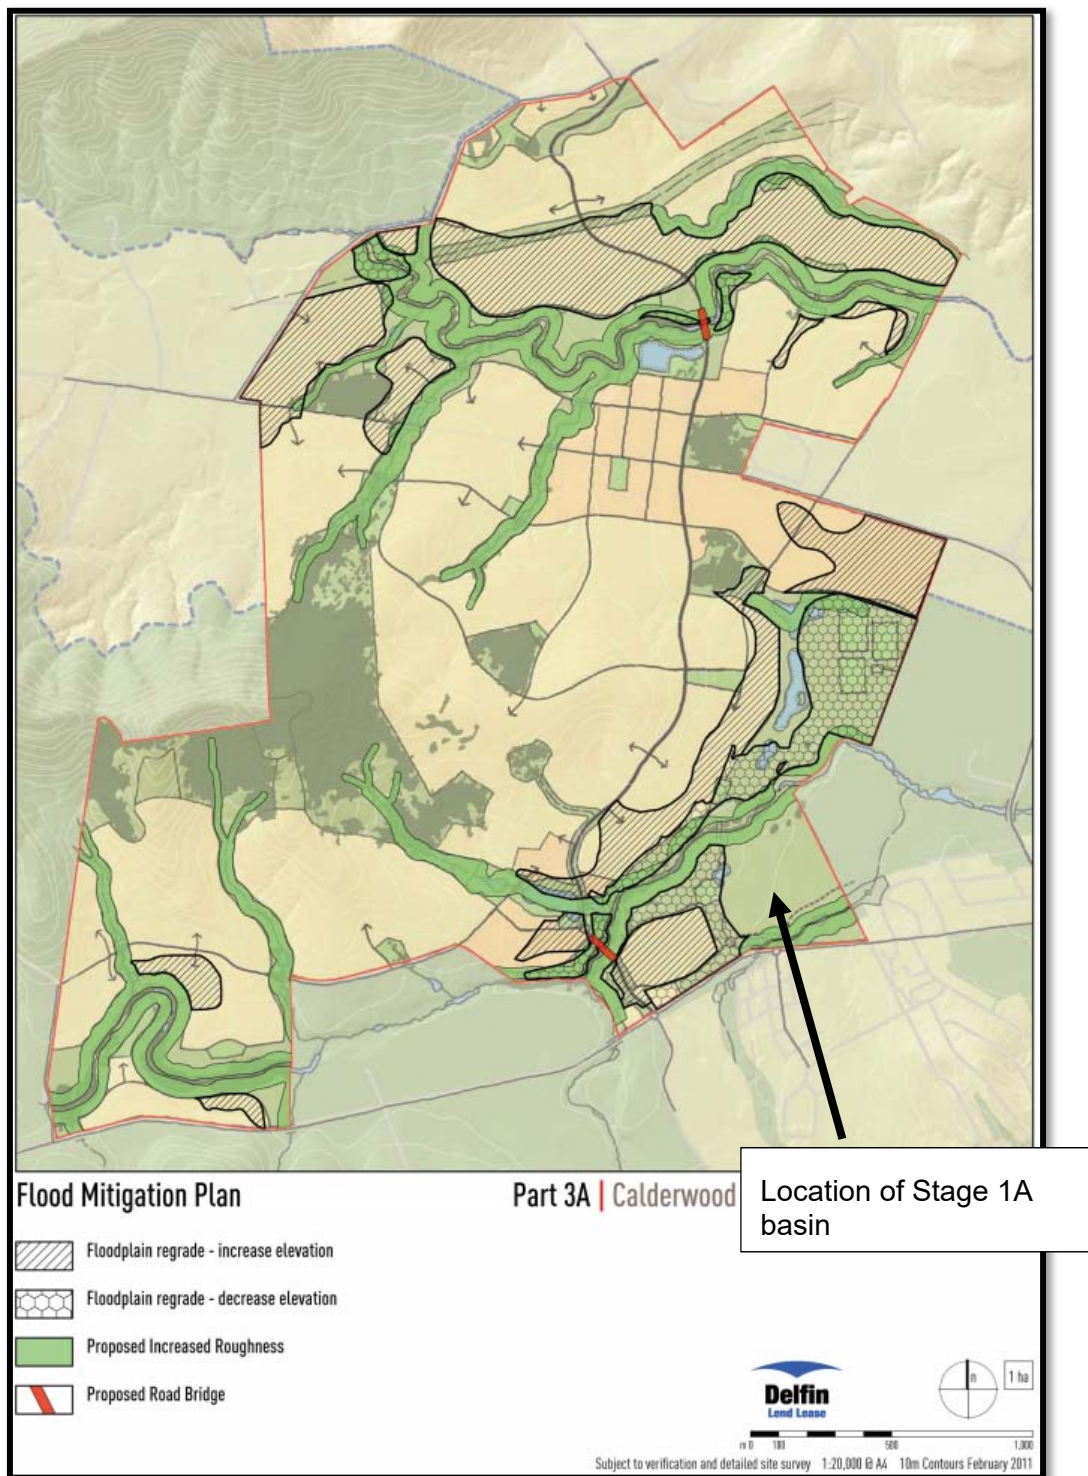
Approved Concept Plan Approval Cut and Fill Plan
